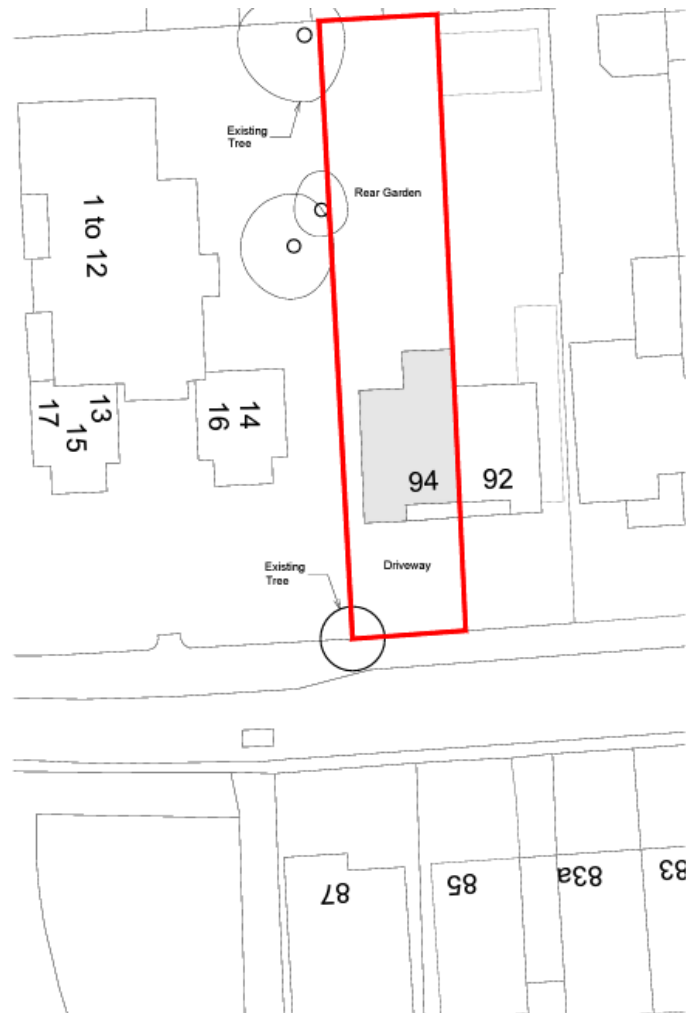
Block Plan for 94 Temple Sheen Road, East Sheen SW14 7RR
